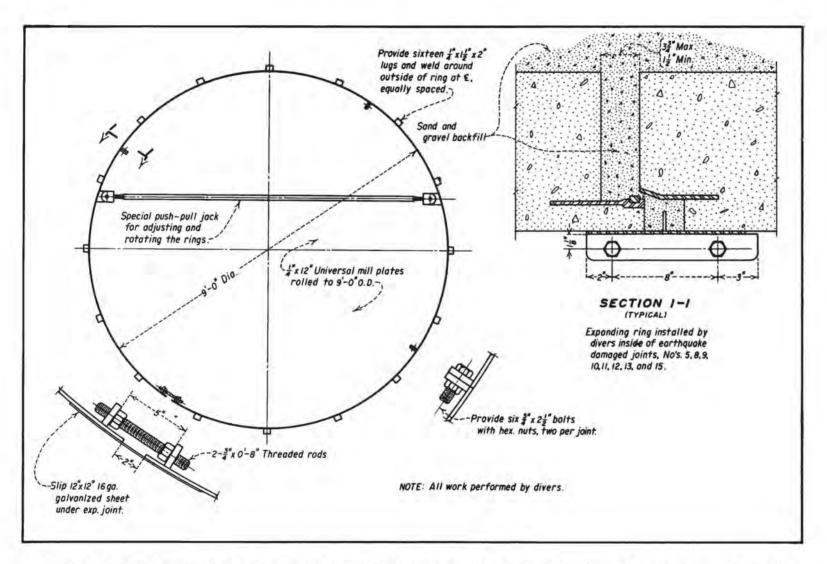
Steel expandable ring used for temporary repair of joints between sections of intake structure conduit (typical case). From drawing No. 783-D-774.
